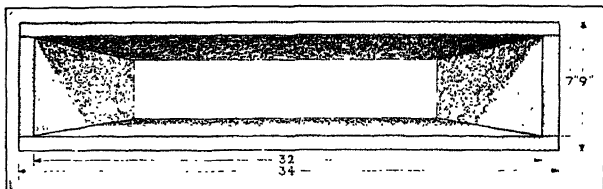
End View of Duct Insulated with Burgess Acousti-Pad
